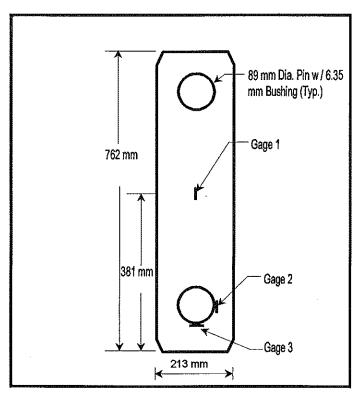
Span 2, Pier 2, Beam C. Expansion End Link Plate Showing Strain Gages.
